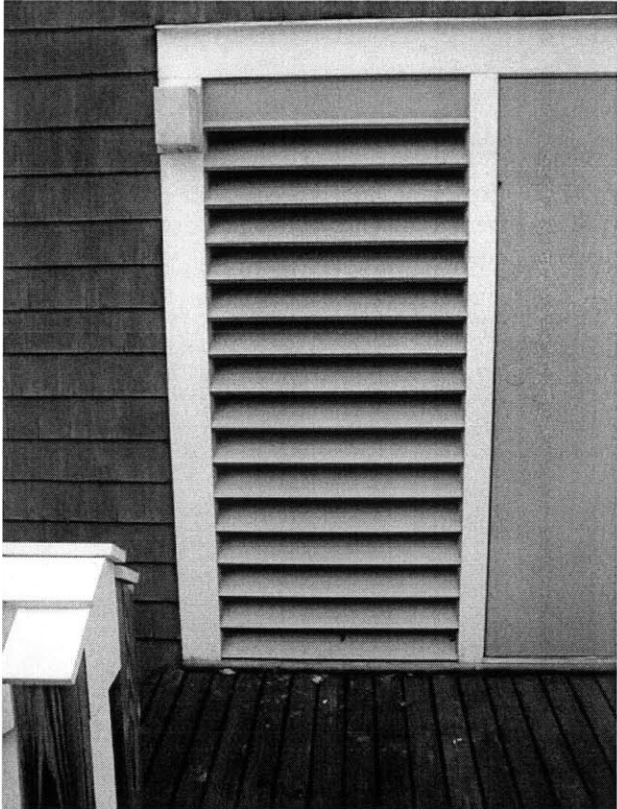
East louvered door. This door, open in conjunction with the west louvered door, allows for cross ventilation twenty-four hours a day.
